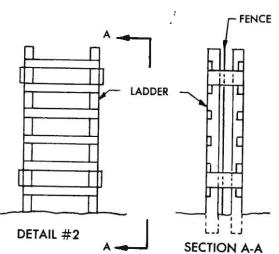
Plans and specifications for the installation of a 3-way wildlife-livestock exclosure.
